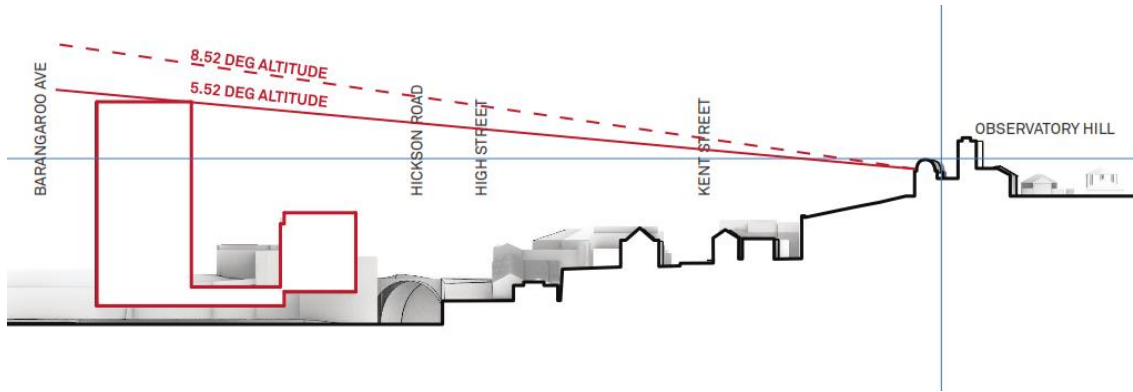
Sight line from Sydney Observatory south dome to the highest point on the taller tower building envelope (azimuth angle 258.2°).
